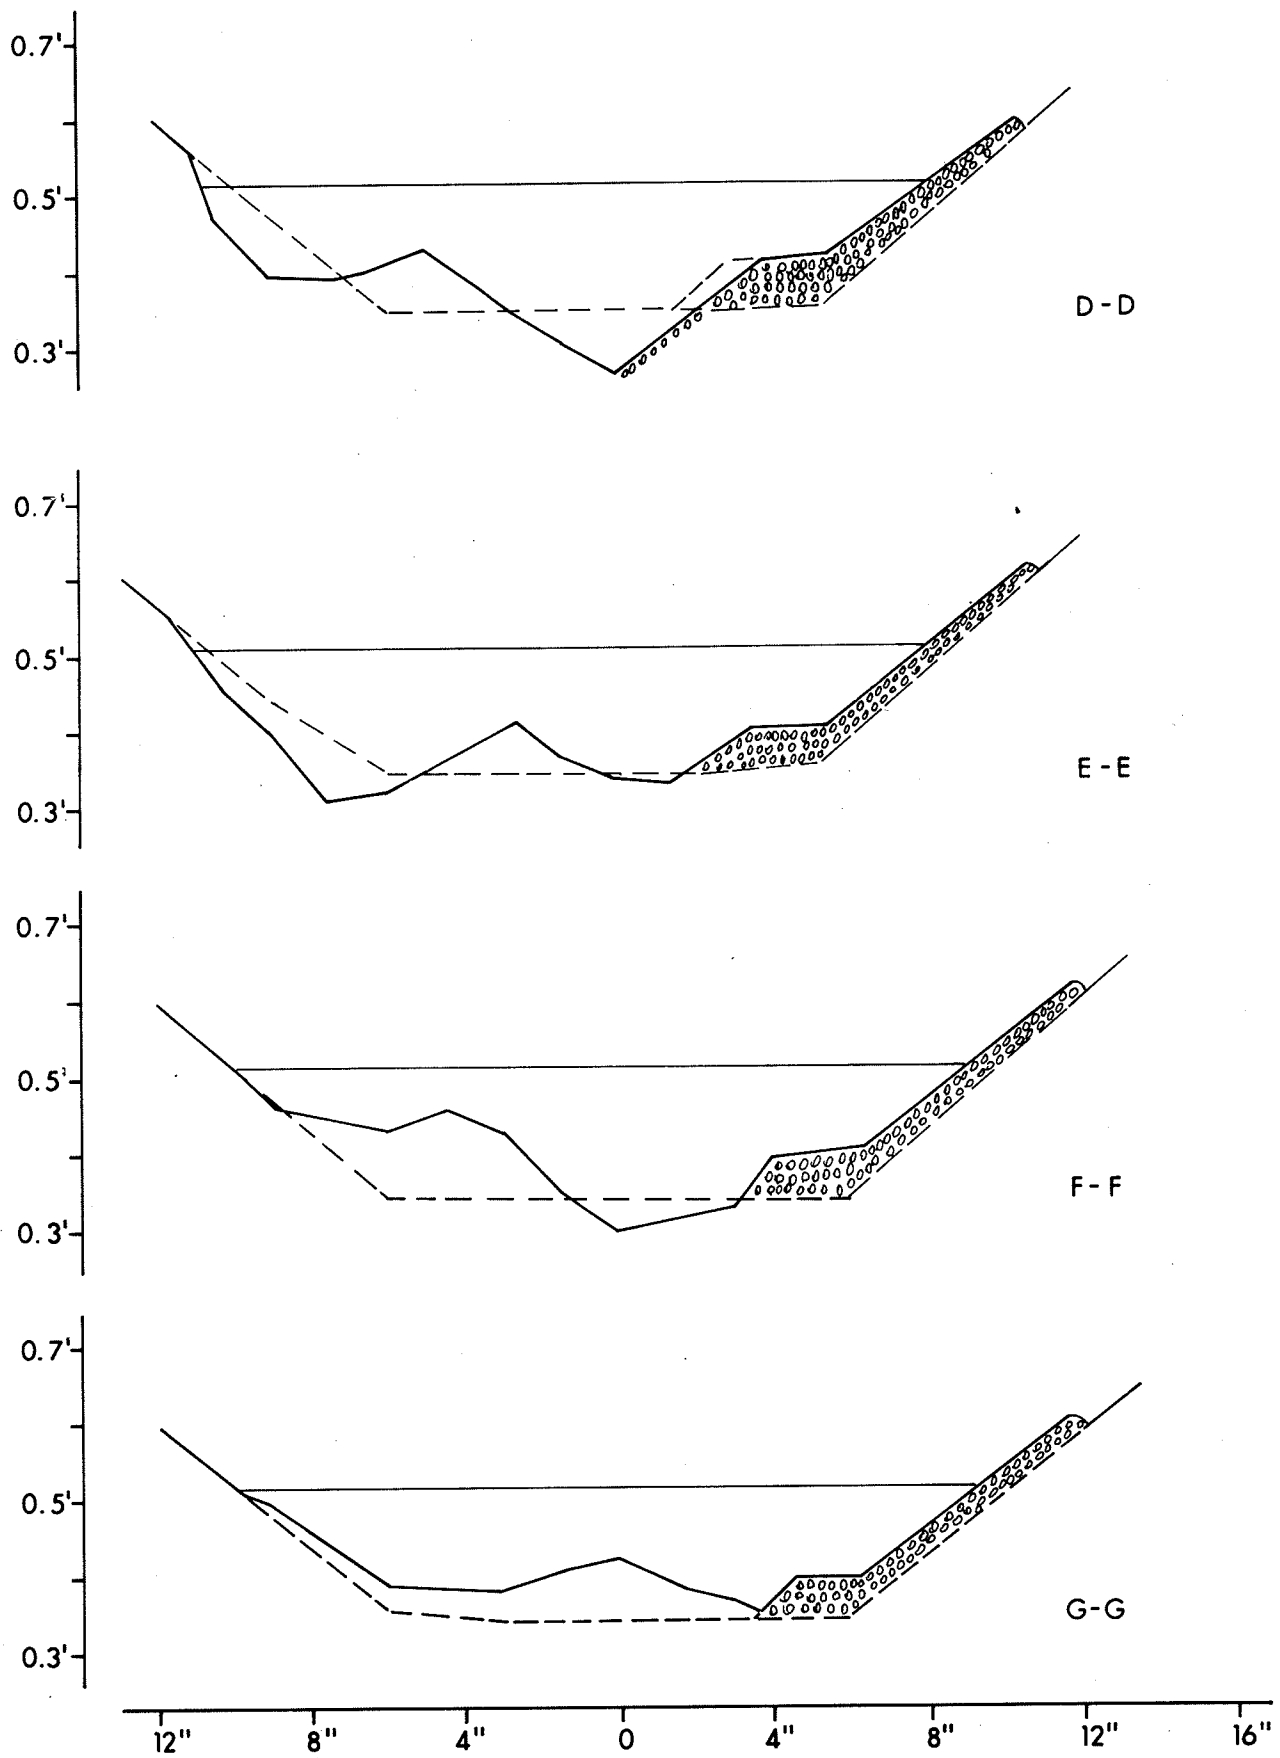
CROSS - SECTIONS FOR TEST No. 5.
